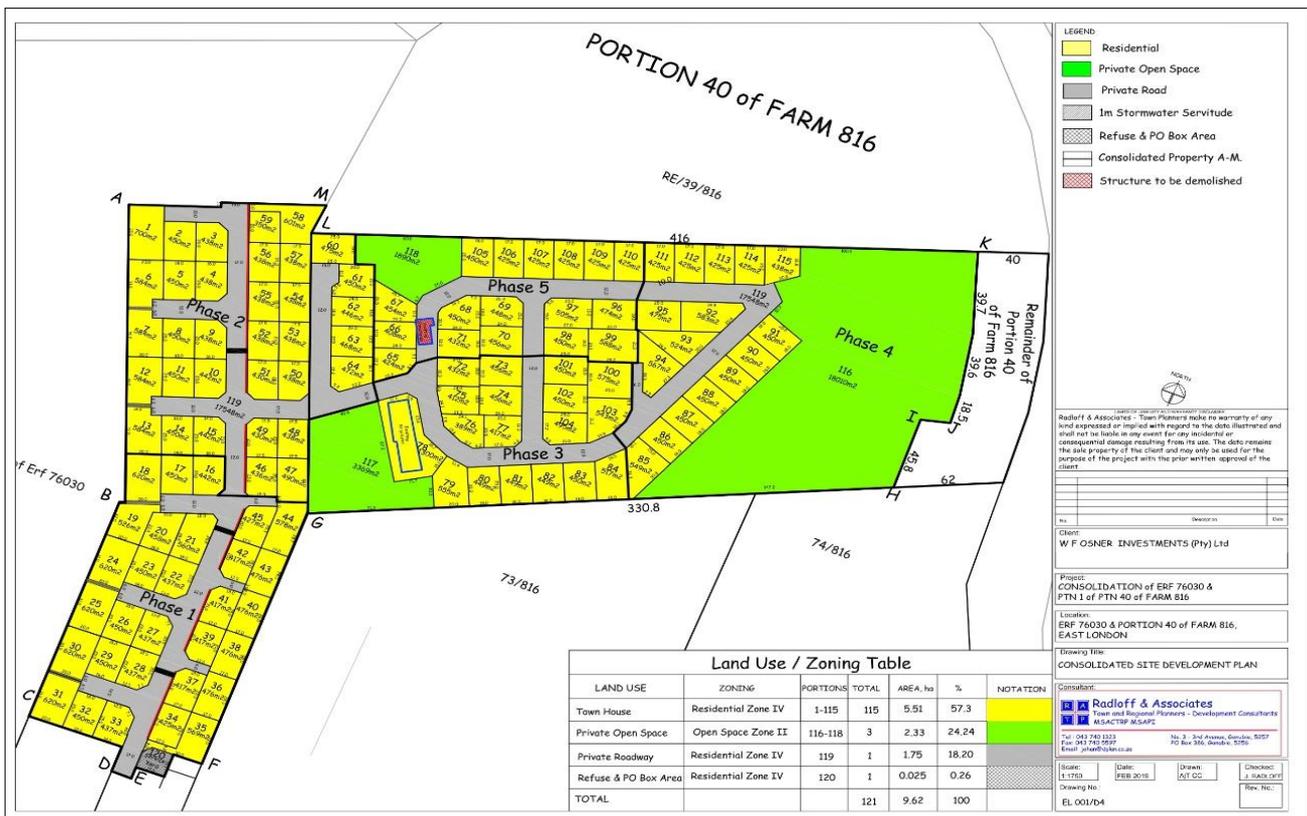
Phase 4 location of the Osner residential development and the layout plan.
